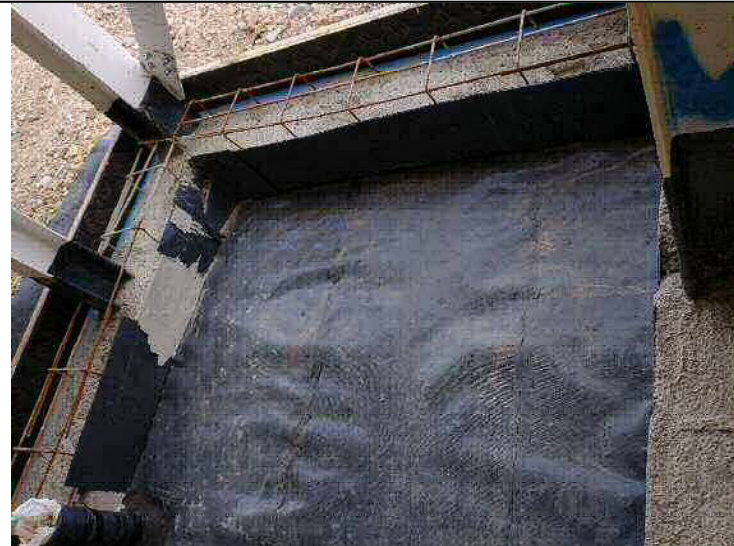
An example of some of the detailing around service entries (Slab E & F)
